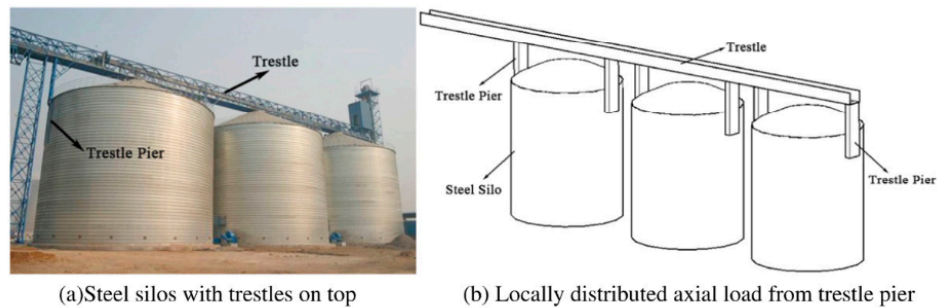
Steel silo wall under local vertical load caused by trestle piers. (a) Steel silos with trestles on top. (b) Locally distributed axial load from trestle pier.
